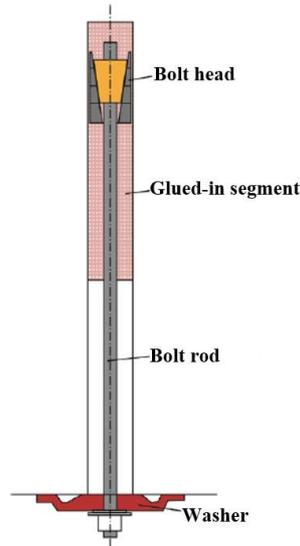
Mechanical bolt with glued-in segment [83]
